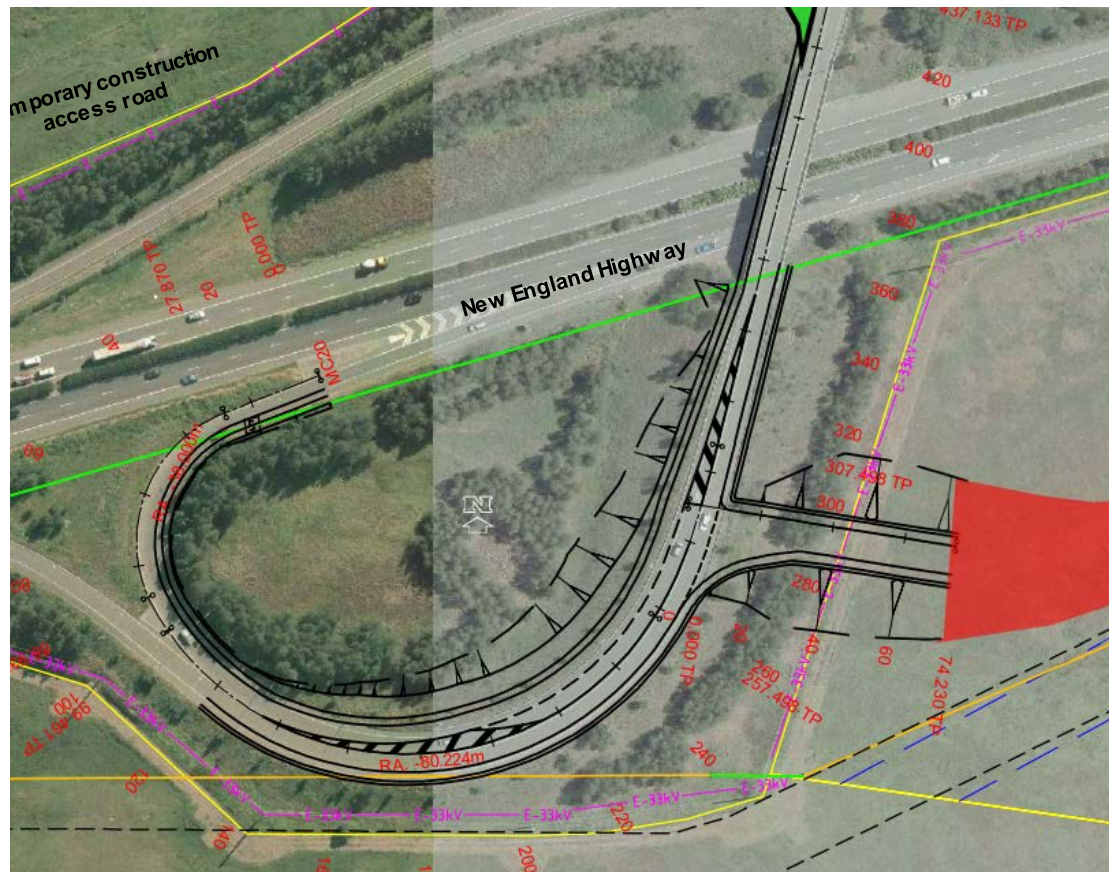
Proposed sketch layout of Anderson Drive intersection with the temporary construction access road
